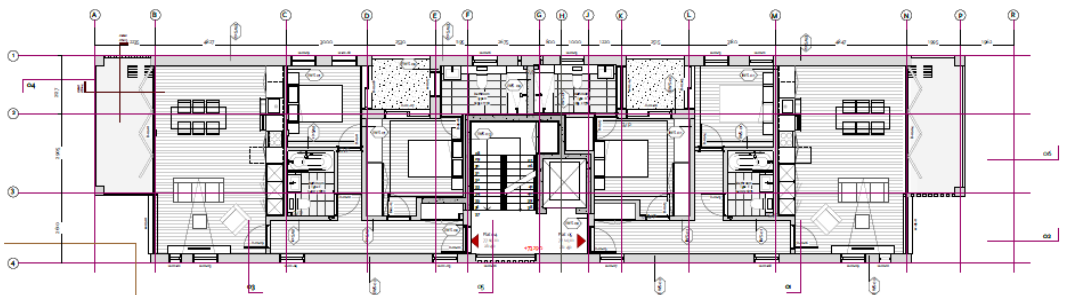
Showing floorplan approved under Non-Material Application for 58 Whytecliffe Road South.
